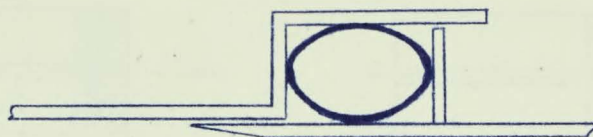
8 ft. TUNNEL PROJECT - APPROXIMATE LAYOUT
